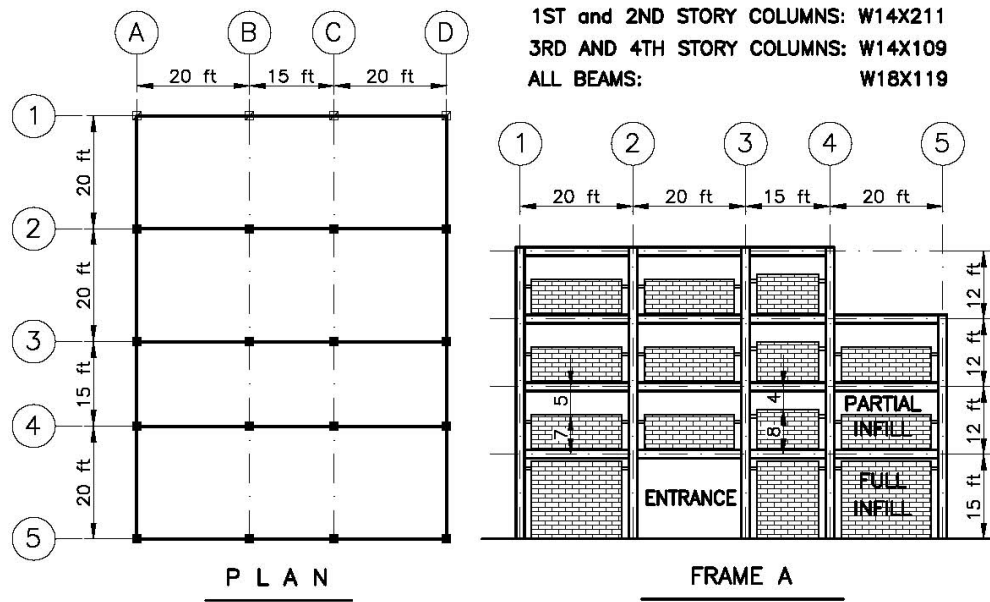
Four-story building example (1 in. = 25.4 mm).
